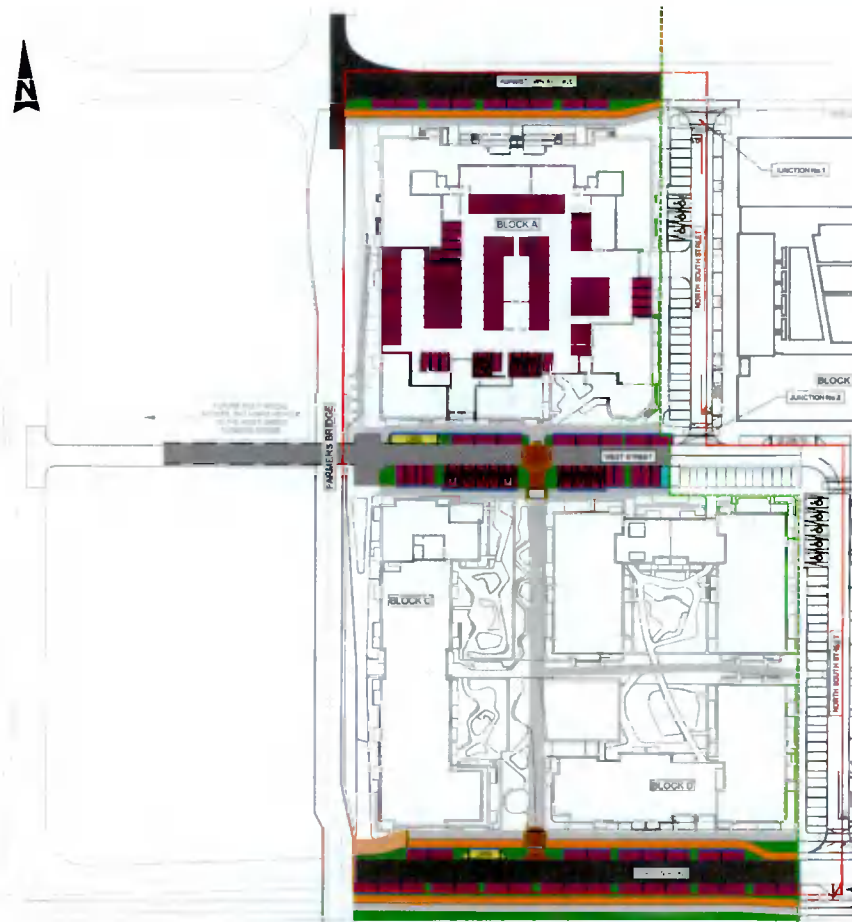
Extract from Drawing No: 5150924 / HTR /08 / DR /0102 Junction Layout Plan and car parking distribution, prepared by Atkins Consulting Engineers.
